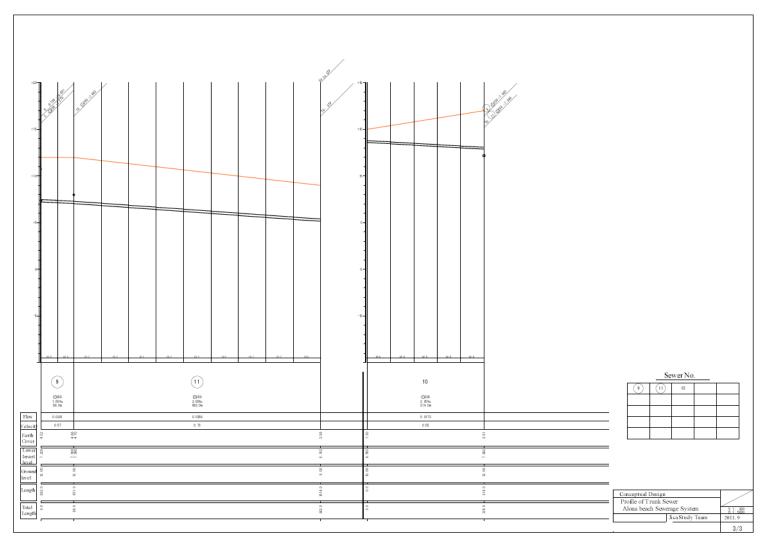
Profile of Trunk Sewer (Alona Sewerage System)
